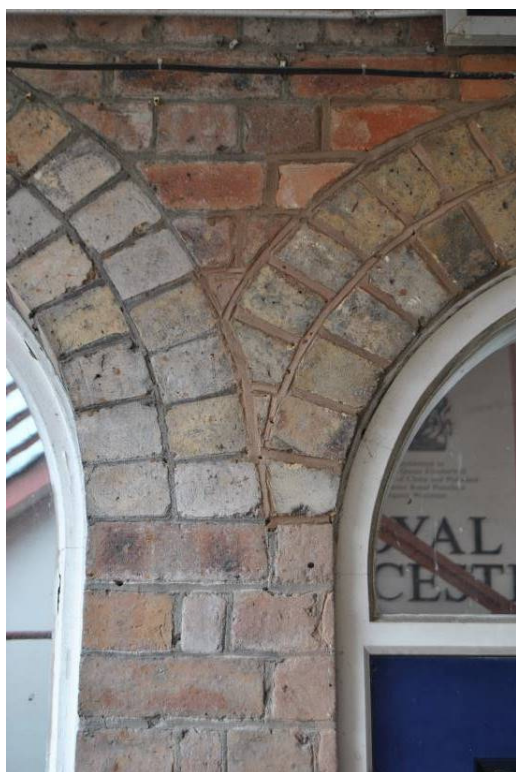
Building J, springing of doorway/window arch indicating door is inserted.
